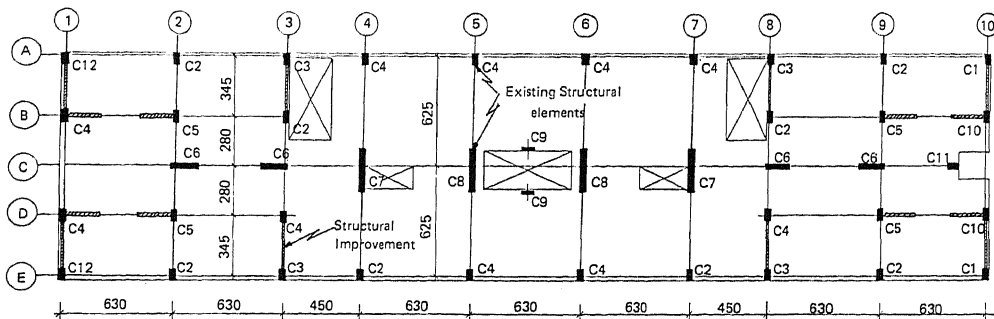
Typical Floor Plan of the Existing and Improved Structure of 14 Story Building - Type C, Tlatelolco, Mexico D.F.
